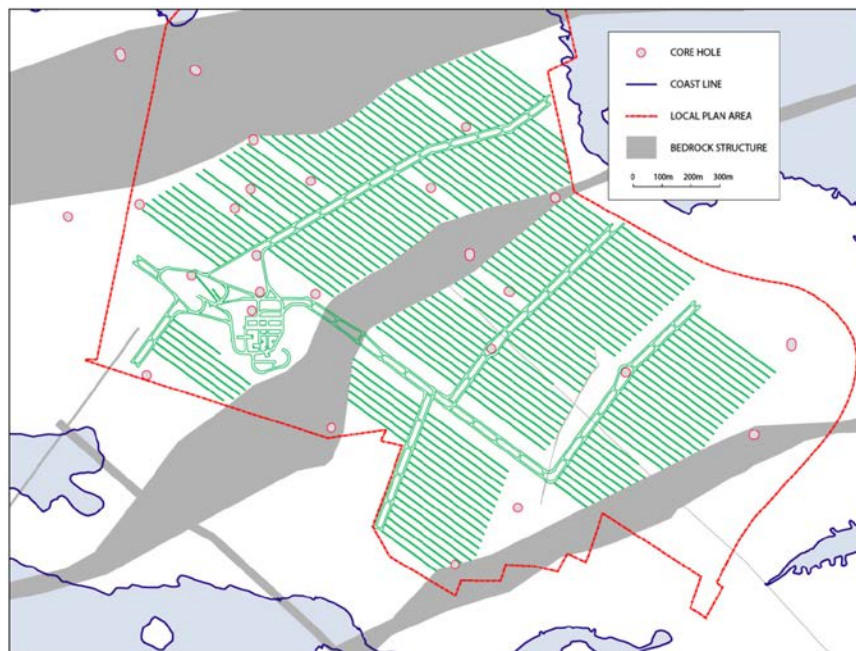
Posiva's layout for underground repository at Olkiluoto site [1].
